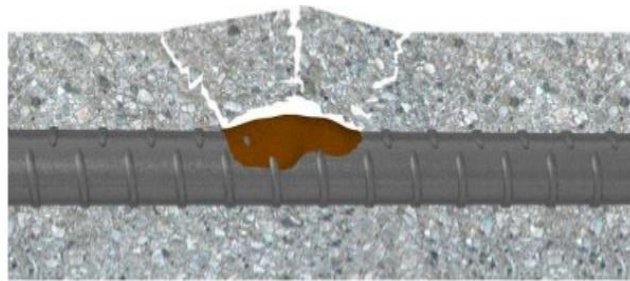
Occurrence of corrosion due to the presence of water in concrete structure
